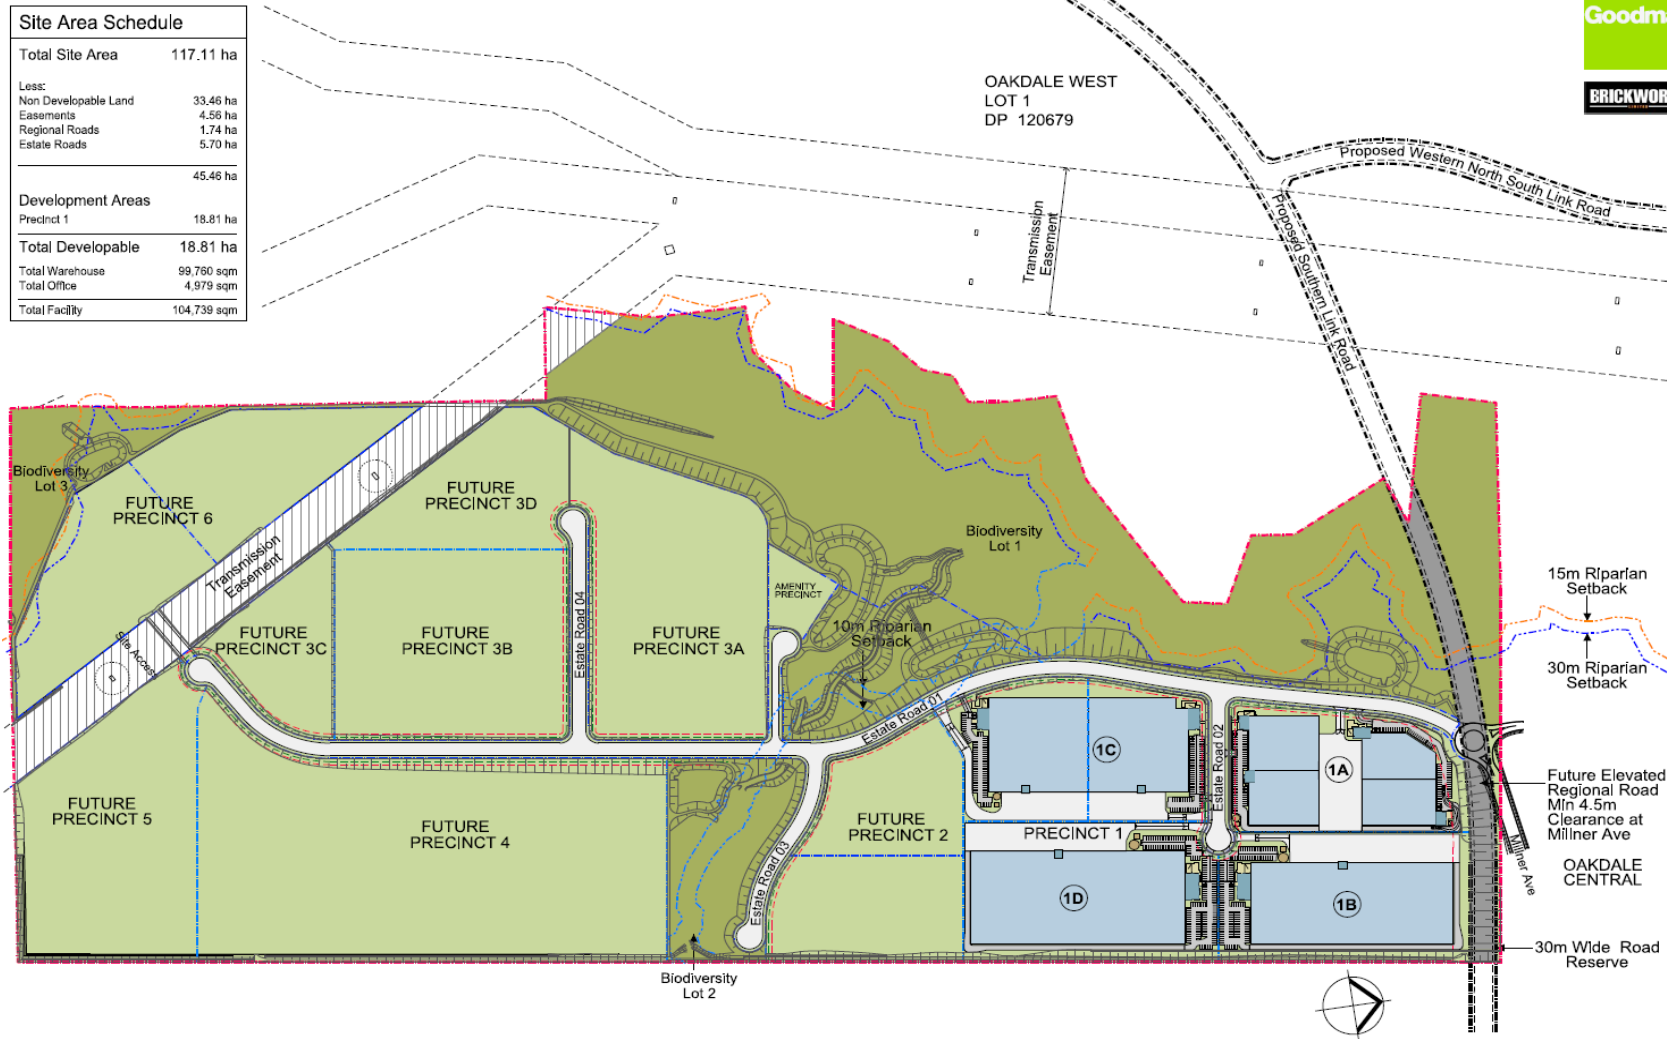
Precinct 1 Plan – Oakdale Industrial Estate – South
